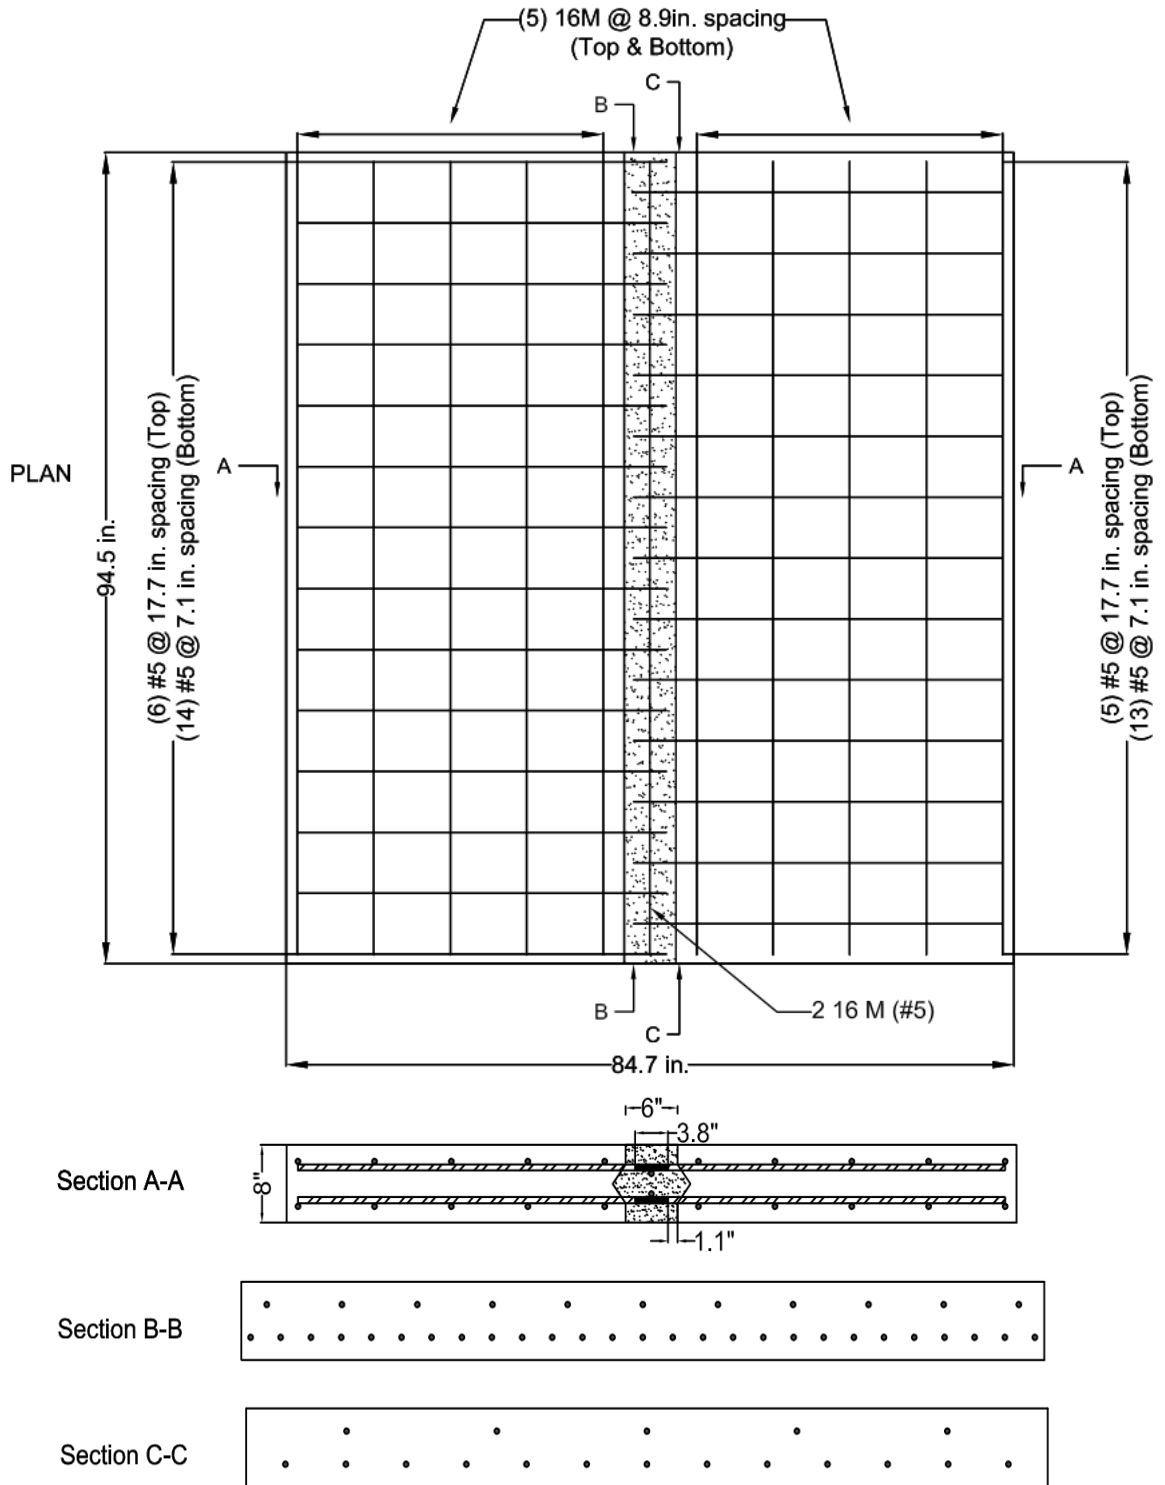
6-inch joint with straight bar details (Model S6)
